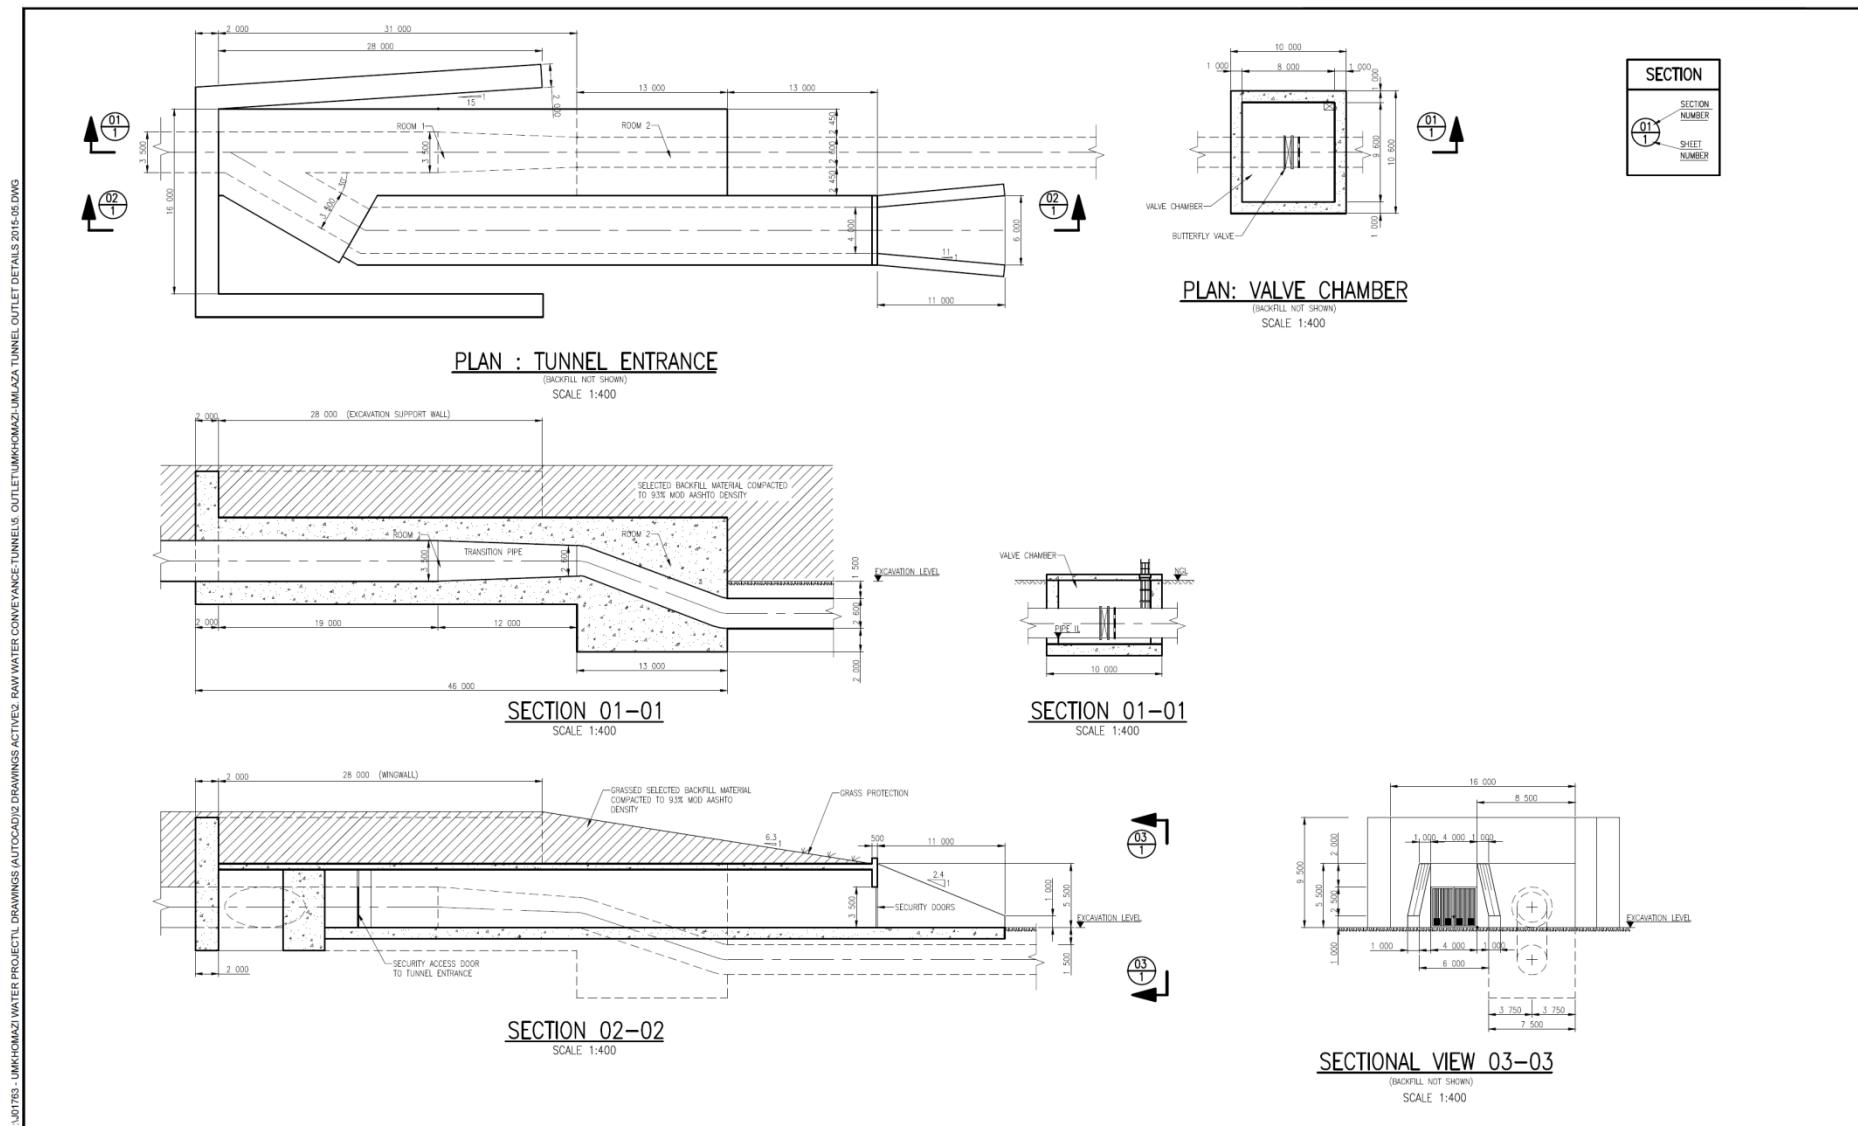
G.2: Details of Access Arrangements at Tunnel Outlet Portal
